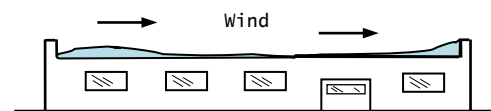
Building elevation depicting the effects of snow drifting around roof obstructions on a flat roof.
